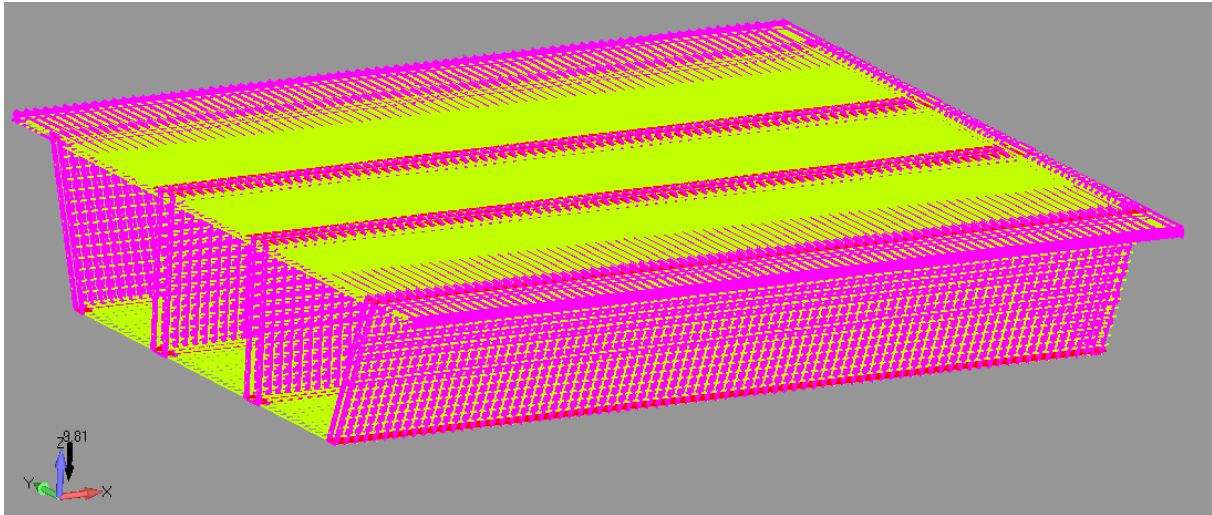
RC Bridge. Macro-element rebar mesh of the opening O6.
